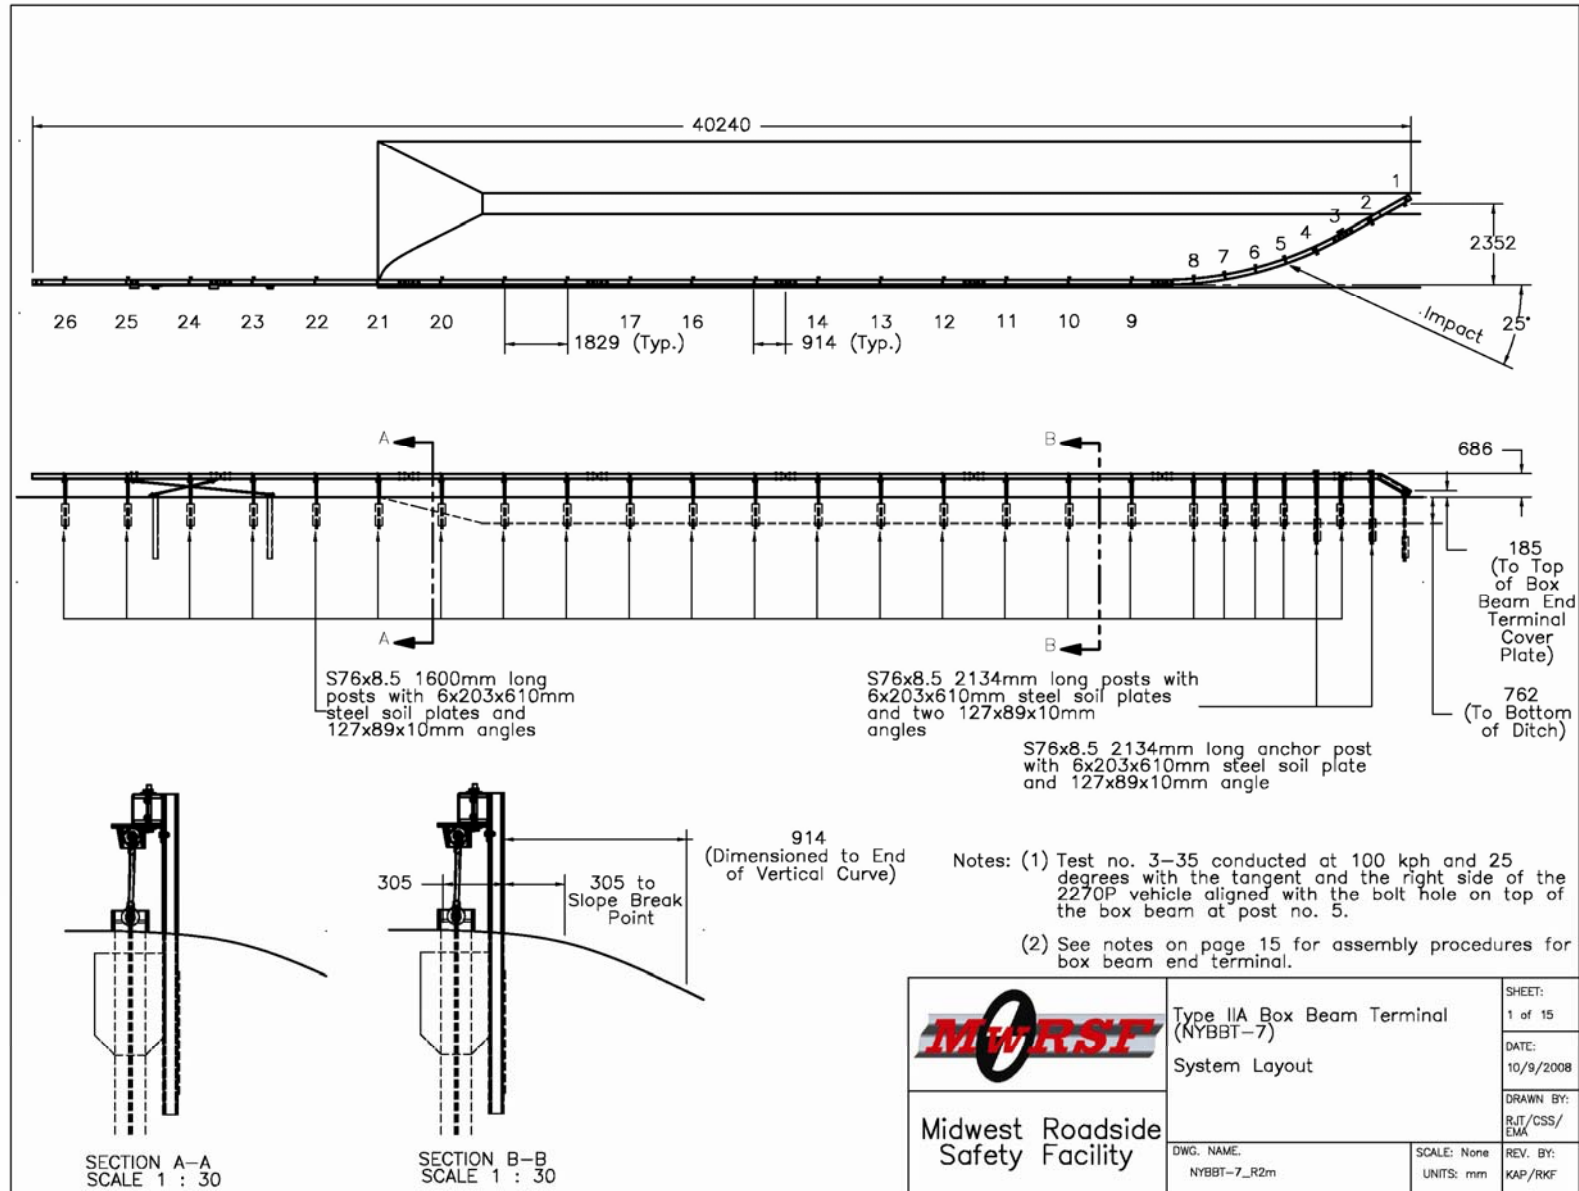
Modified Type IIA Box Beam Terminal System Installed in a Ditch Details, Test No. NYBBT-7
